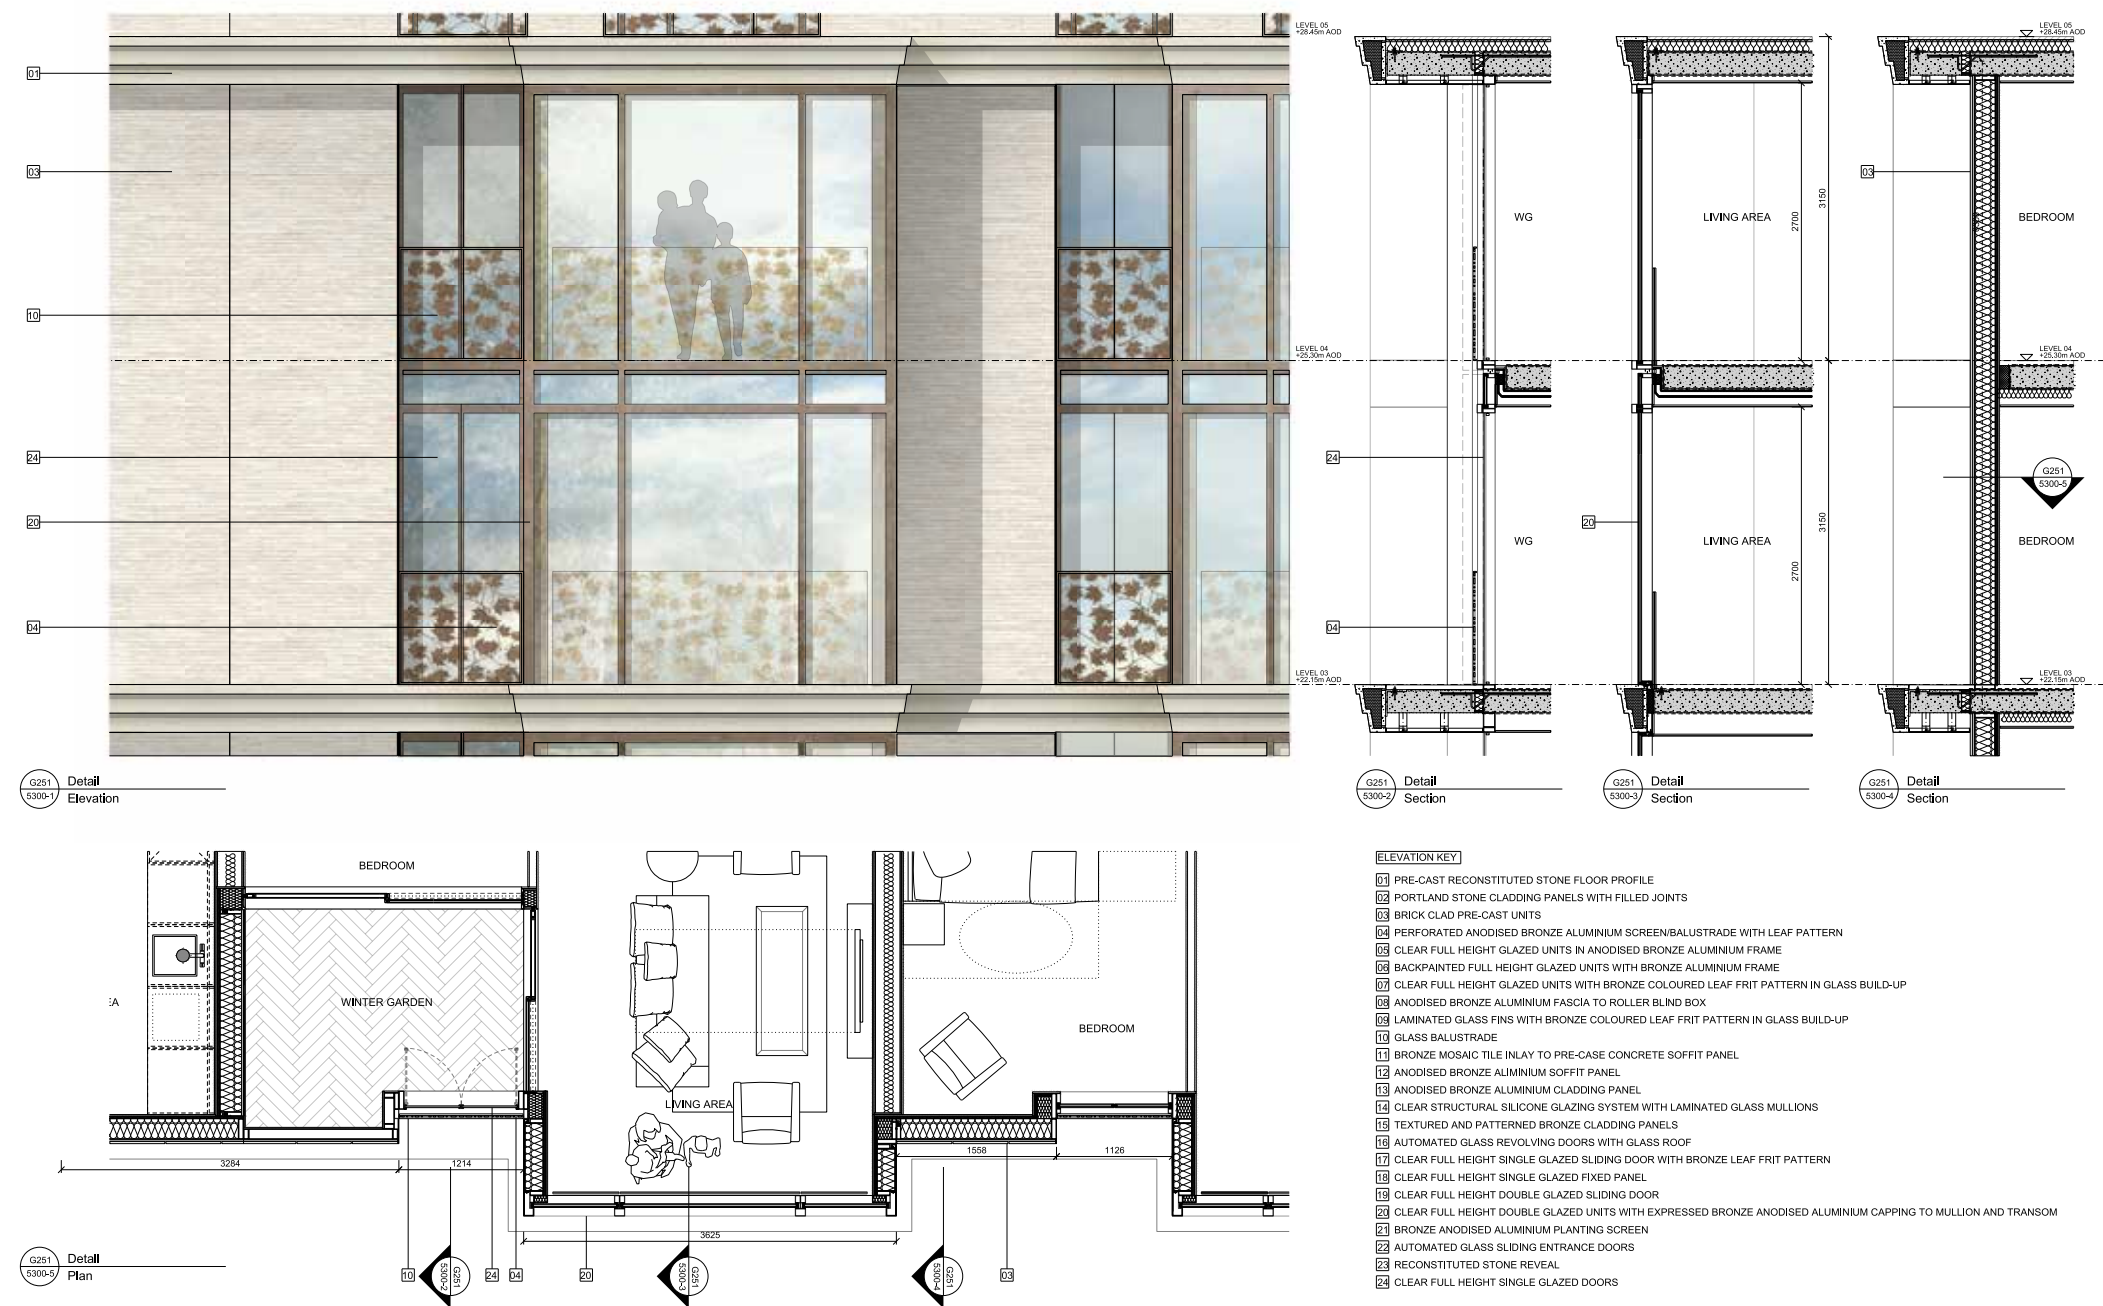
98 Extract of a planning submission drawing illustrating the detail design intent for the facade of the residential building onto Courtfield Road
